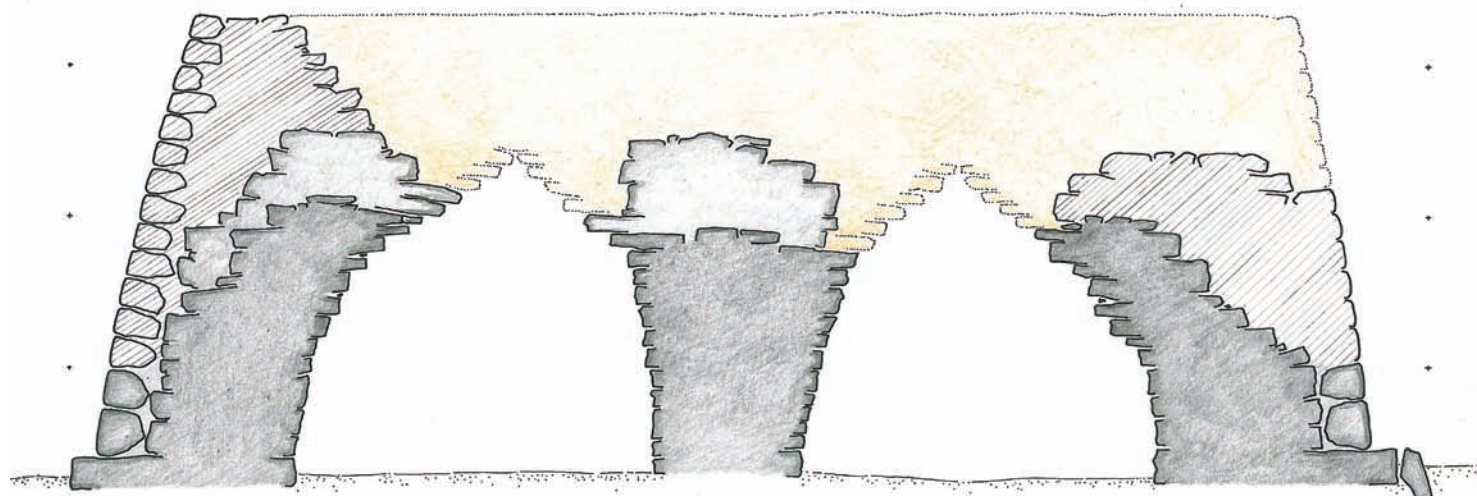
Bat, tomb 154; east-west section. Status of preserved, reconstructed parts and the proposed former shape. Key: dark = original; preserved parts in east-west section; grey = evidence of preserved masonry outside the section; hatched = reconstruction 2008; yellow = missing parts, completed in drawing; grid = 1 m.
